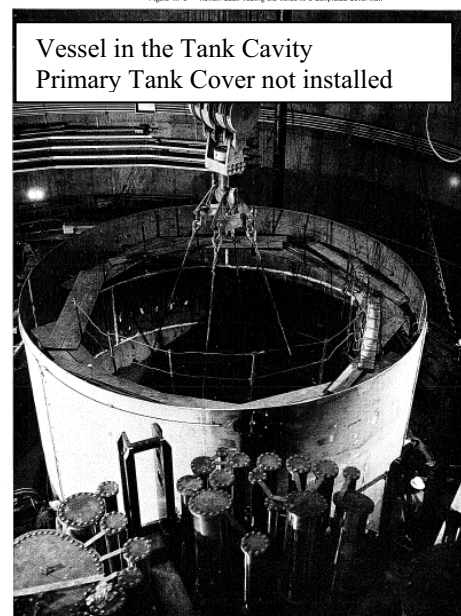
Inner and Outer Vessel Partially Lowered into Cavity
